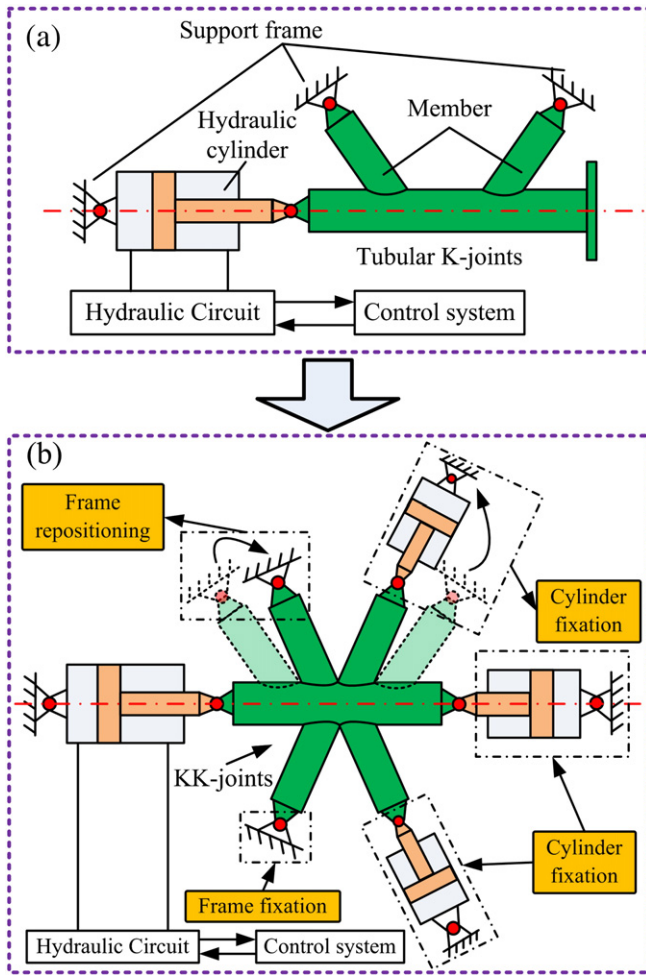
Schematic diagram of a typical loading apparatus for different truss joints.
